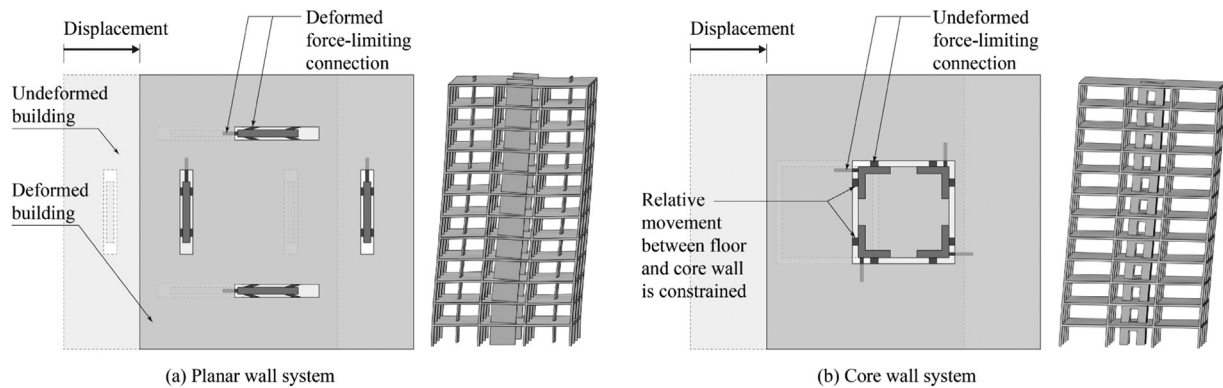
In contrast with the planar wall system, the relative movement between the floors and the core wall system is constrained by the rubber bearings. The planar wall system is shown in (a) and the core wall system is shown in (b).
